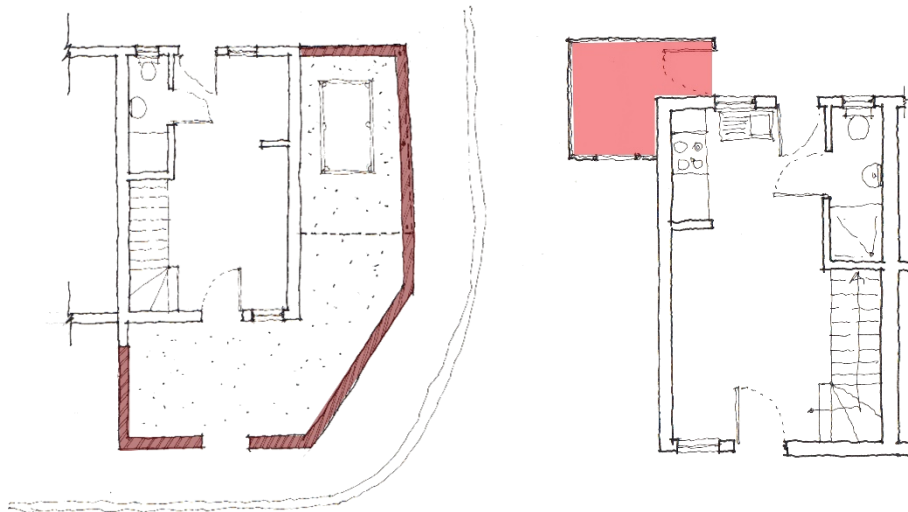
Field drawings. Plan on the left shows the addition of block walls to create outdoor areas. Plan on the right shows the addition of a small room to serve as a spaza shop. Source: Author, 2016.
